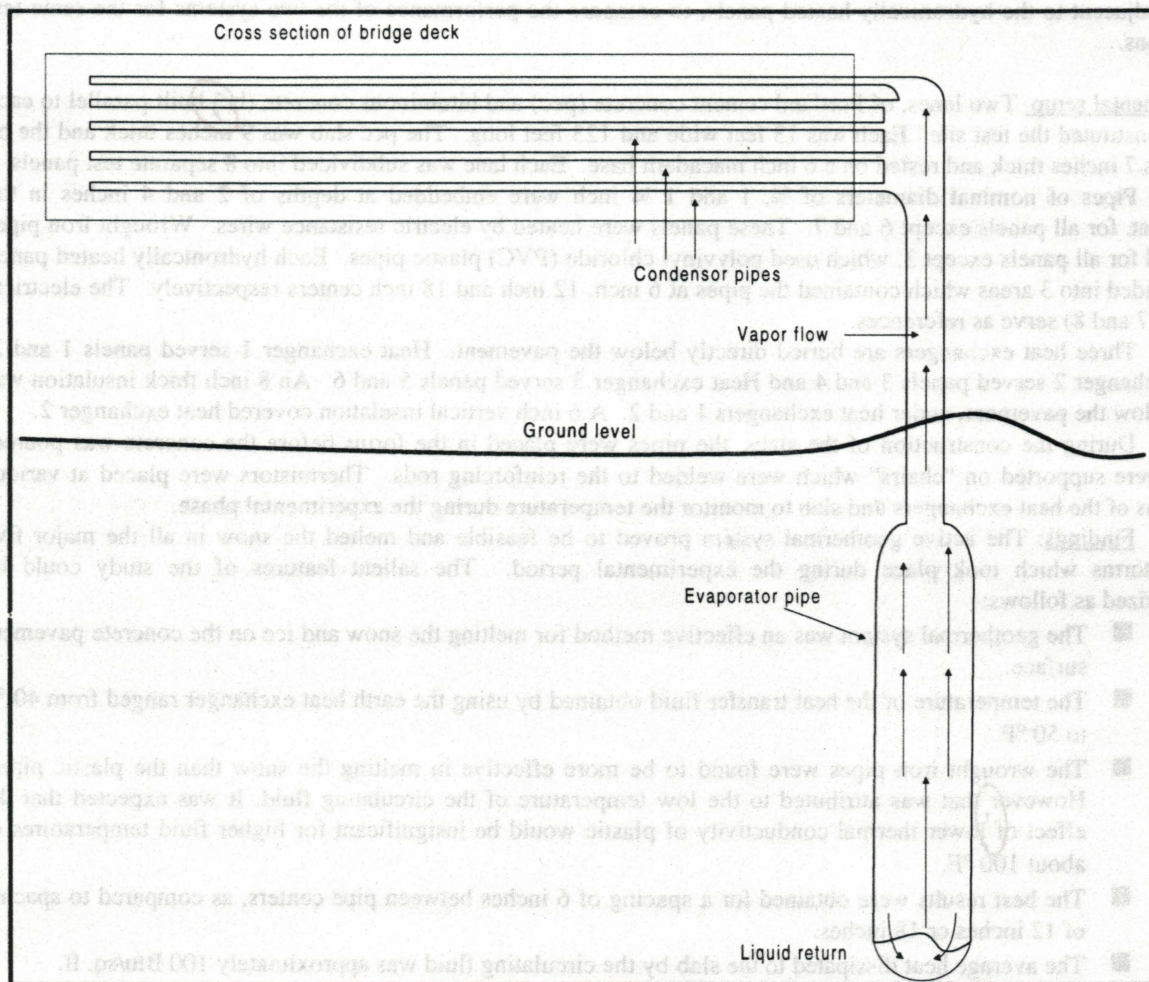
Schematic Arrangement of "Heat Pipe" Bridge Deck Heating System
